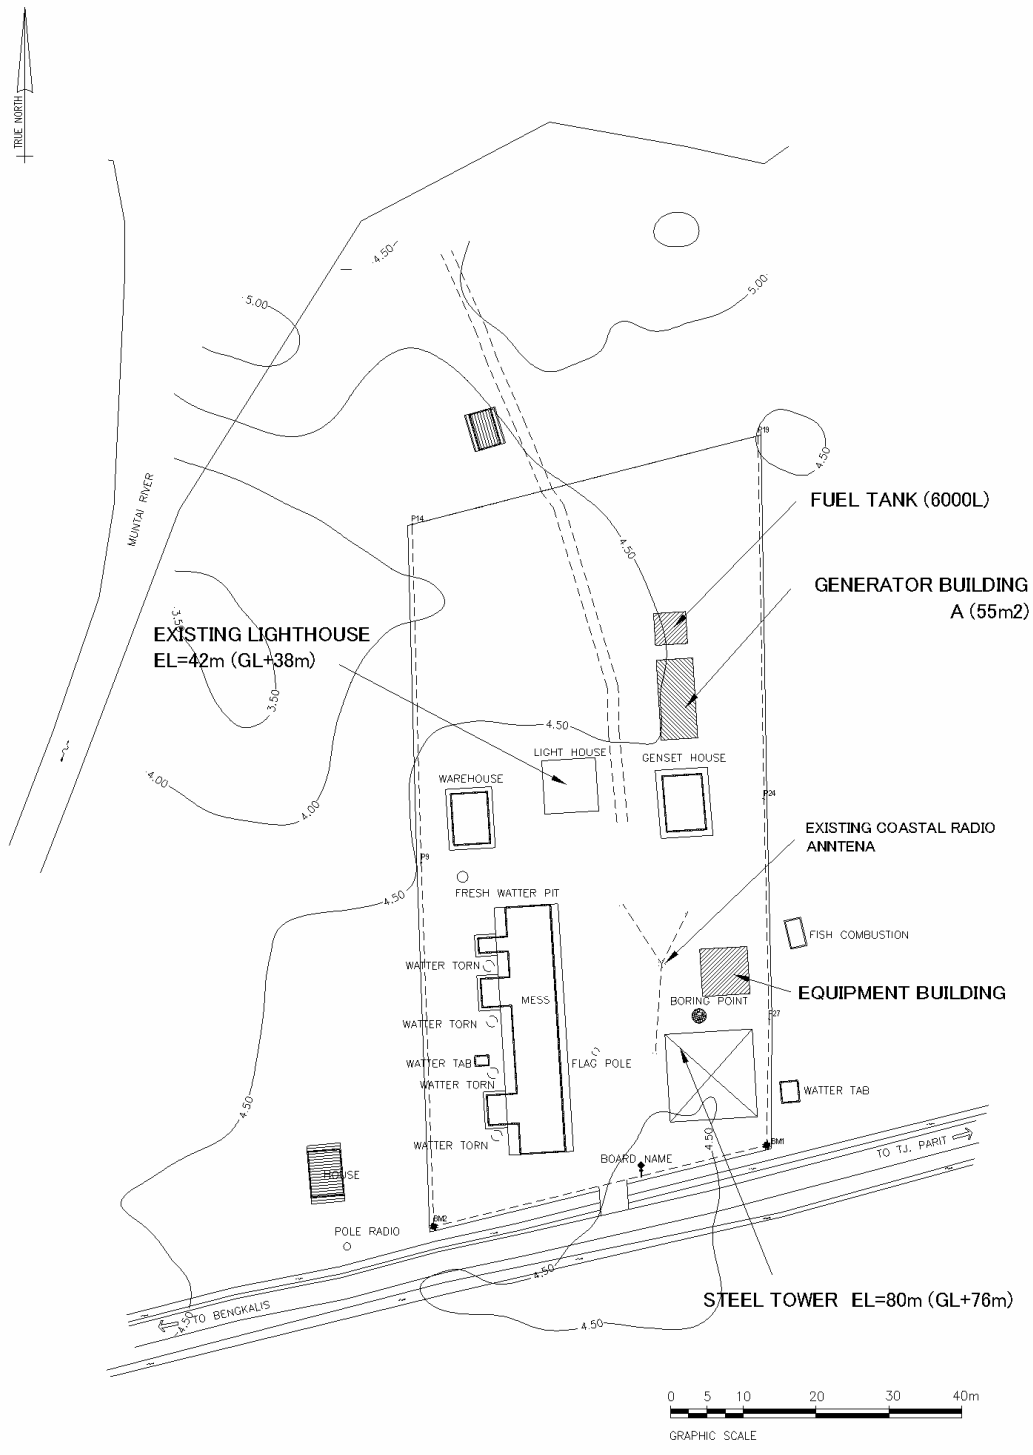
Plot Plan of Facilities (3) Batu Ampar
